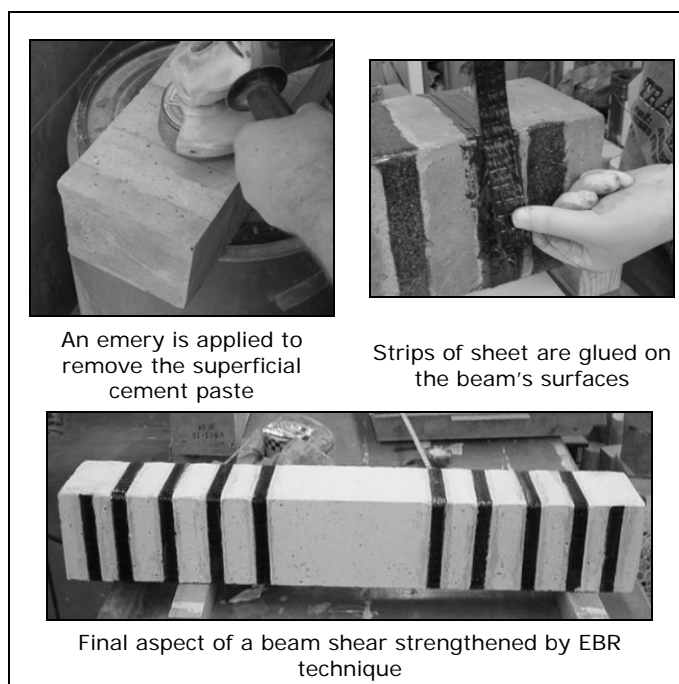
Wet lay-up strips of CFRP sheet by EBR technique.
